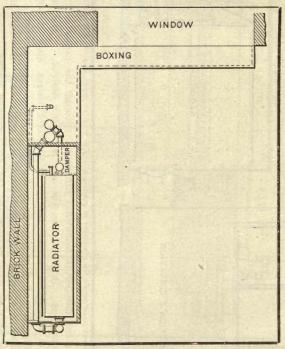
Plan View of Arrangement Shown in Fig. 34
